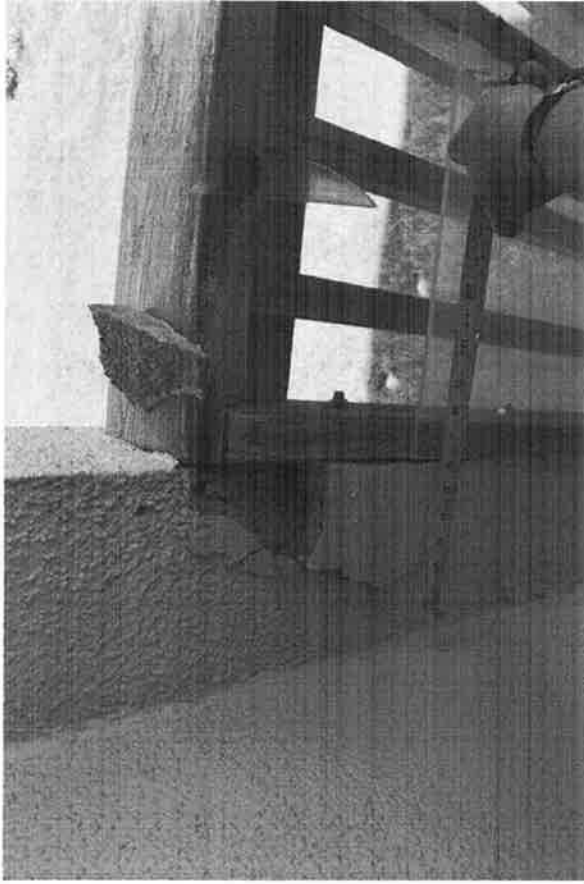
Close up view of previously repaired isolated crack in CMU wall at unit 1101 (typical)
